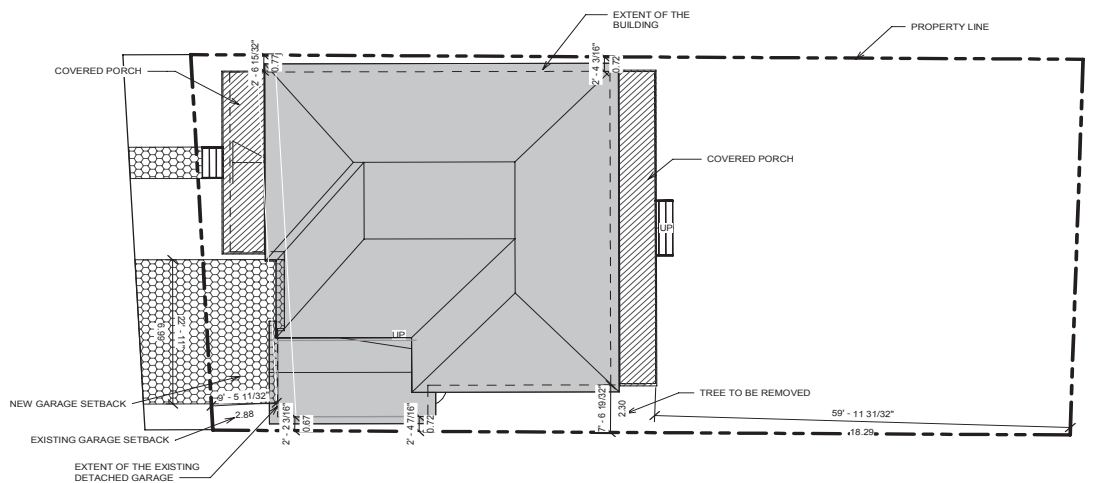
18 Byron Ave E. proposed site plan with parking for two vehicles to the south/front of the site. HCD plan recommends two single track driveways with turf installed between in order to minimize the impact of hard surfacing. Drawing by Third Layer Architects, 2021.
